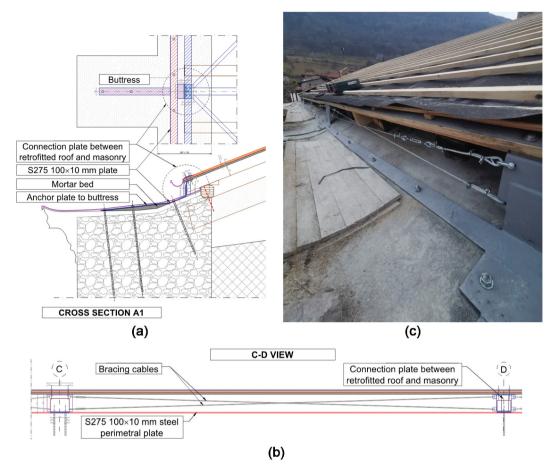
Connection between retrofitted roof diaphragm and masonry walls, with reference to the plan of figure 5: (a) cross section of the joint system in correspondence of the buttress; (b) system of bracing cable between buttresses; (c) realization of the intervention on site.
